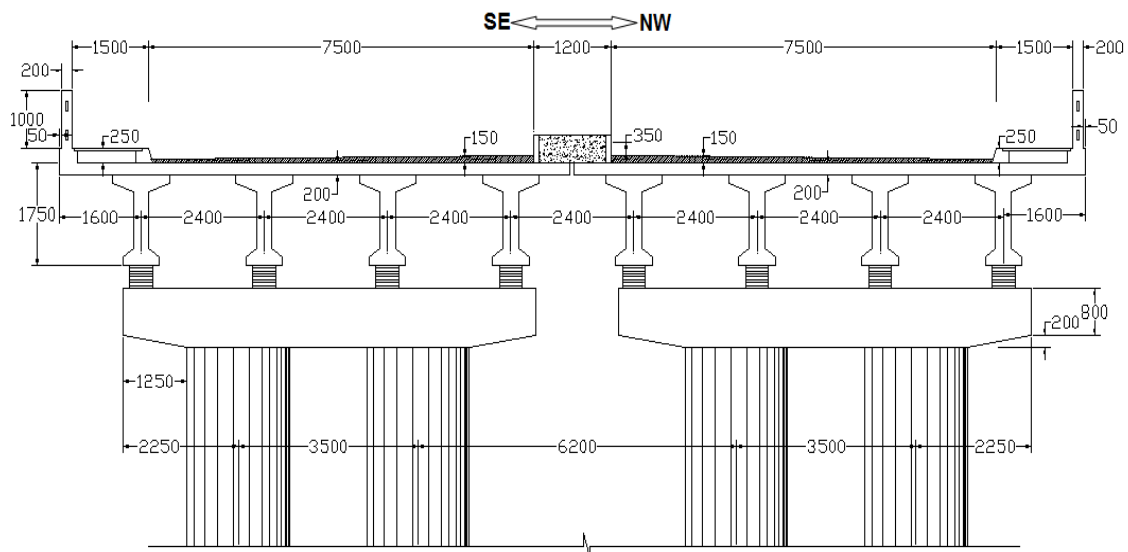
Cross section of tested bridge middle span (All dimensions are in mm)
